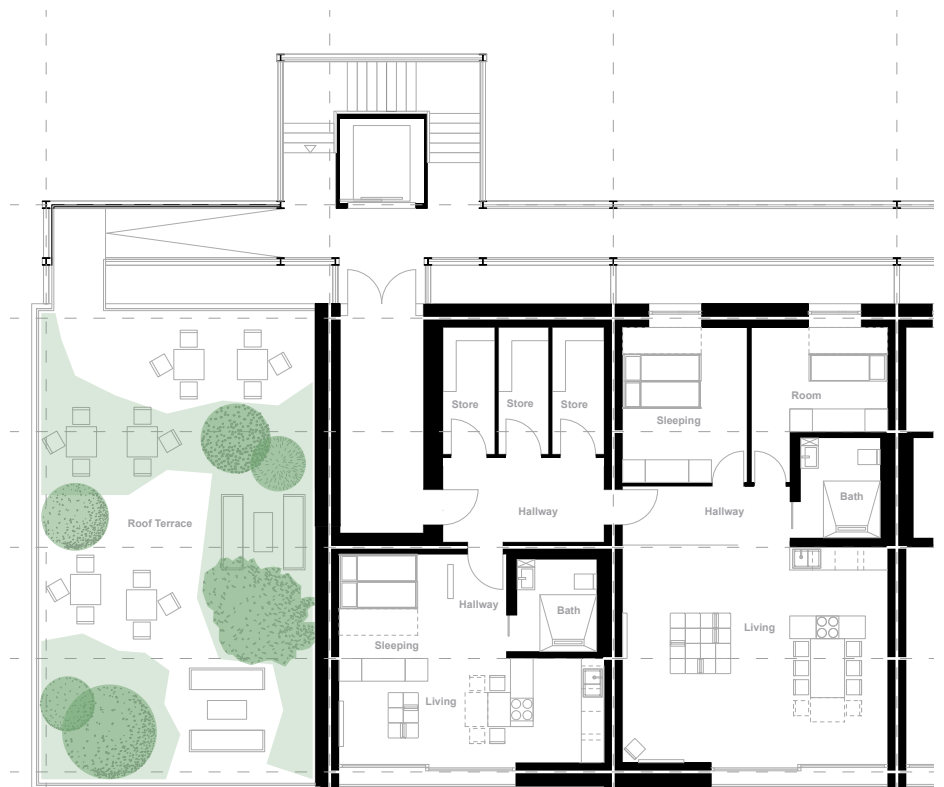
Floor Plan Level 2 of the addition of storeys with a green roof terrace
